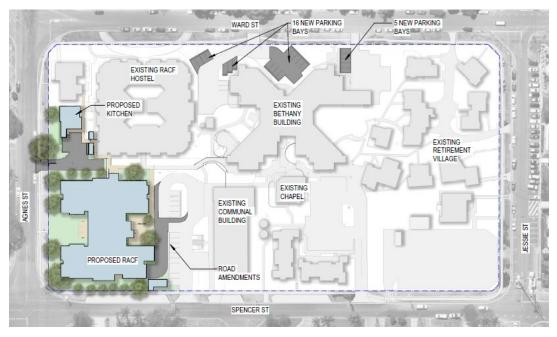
Site layout - Corner of Spencer and Agnes Streets, The Range
